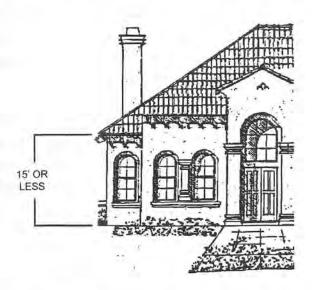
SINGLE-STORY HEIGHT ELEMENT SPECIFICATIONS
